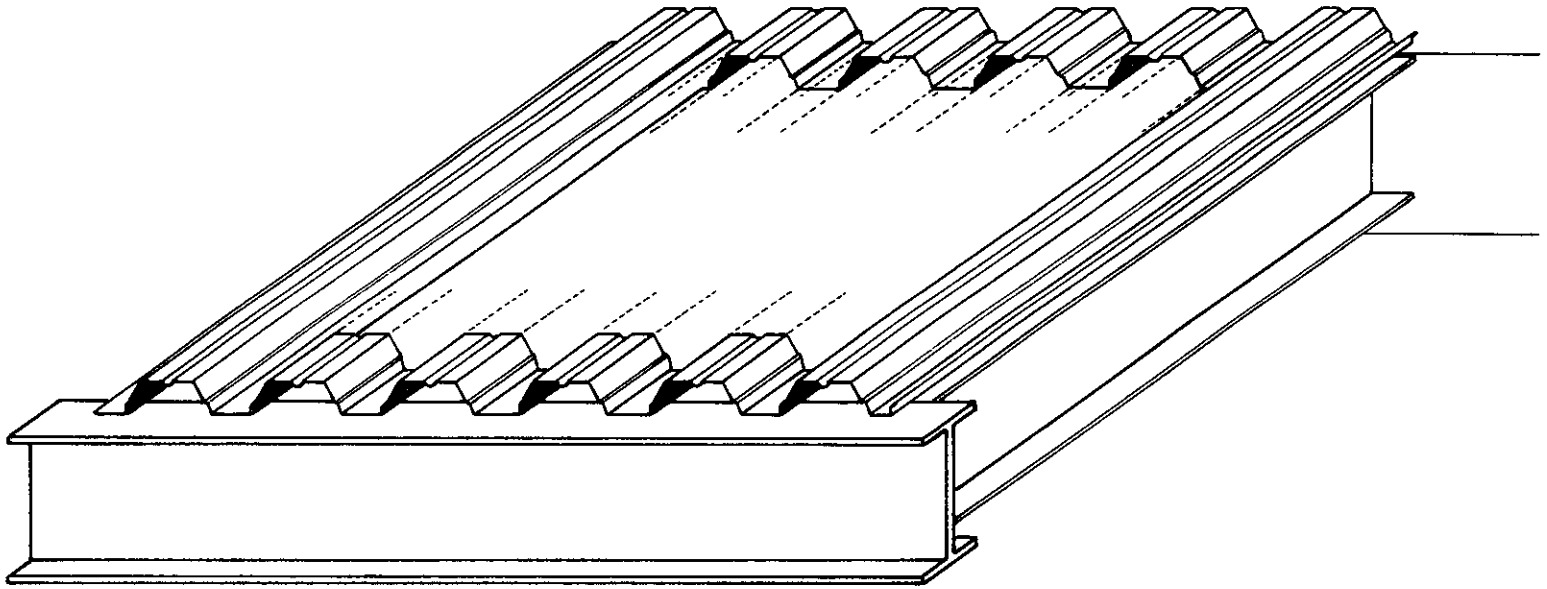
Edge zone of deck effective in transferring forces from frame to concrete slab.
